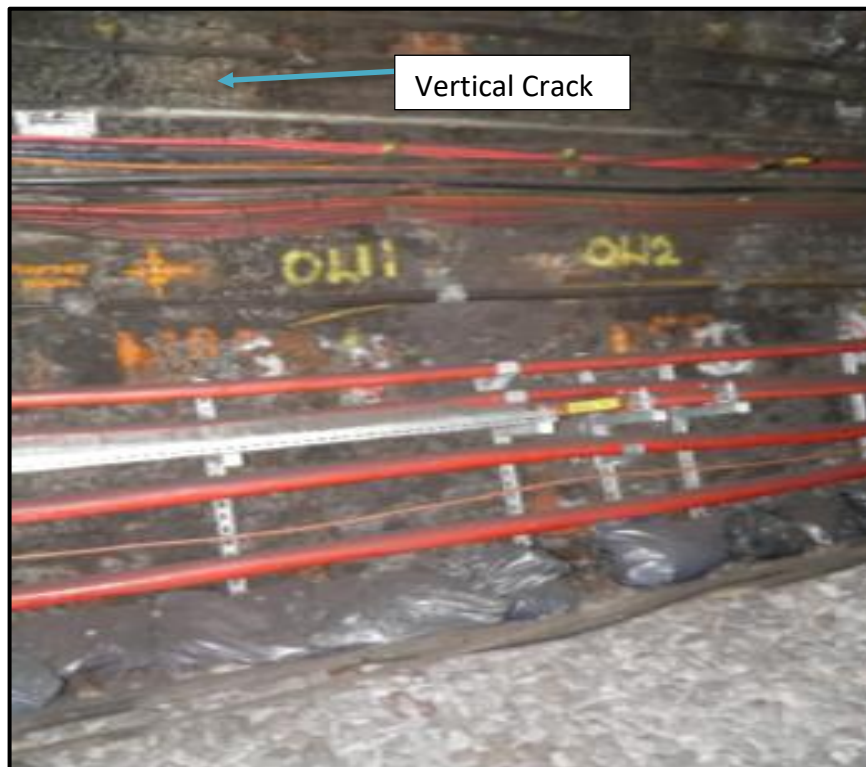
TL53 vertical crack at south abutment 581m from west visual inspection
